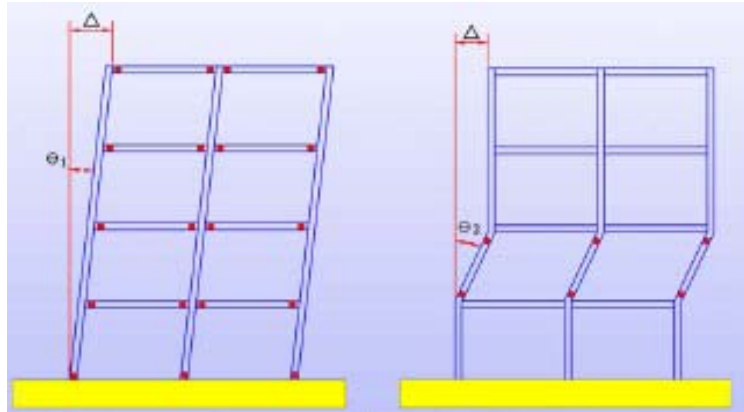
Comparison between different failure mechanisms: The recommended Beam-Damage-Mechanism (left); the Column concentrated Damage-Mechanism (not recommended) [11]
